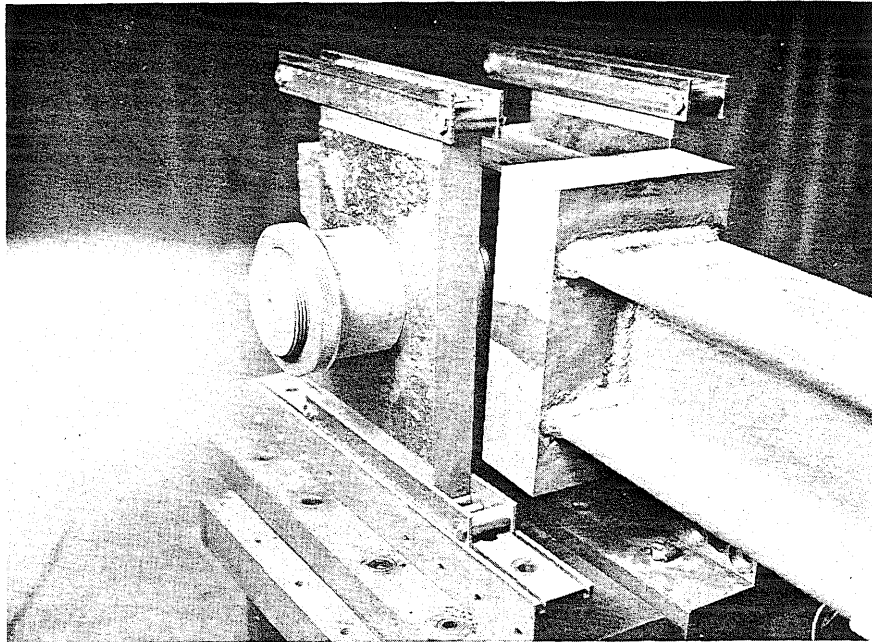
WELDED CONNECTION BETWEEN SPECIMEN AND BEARING BLOCK
